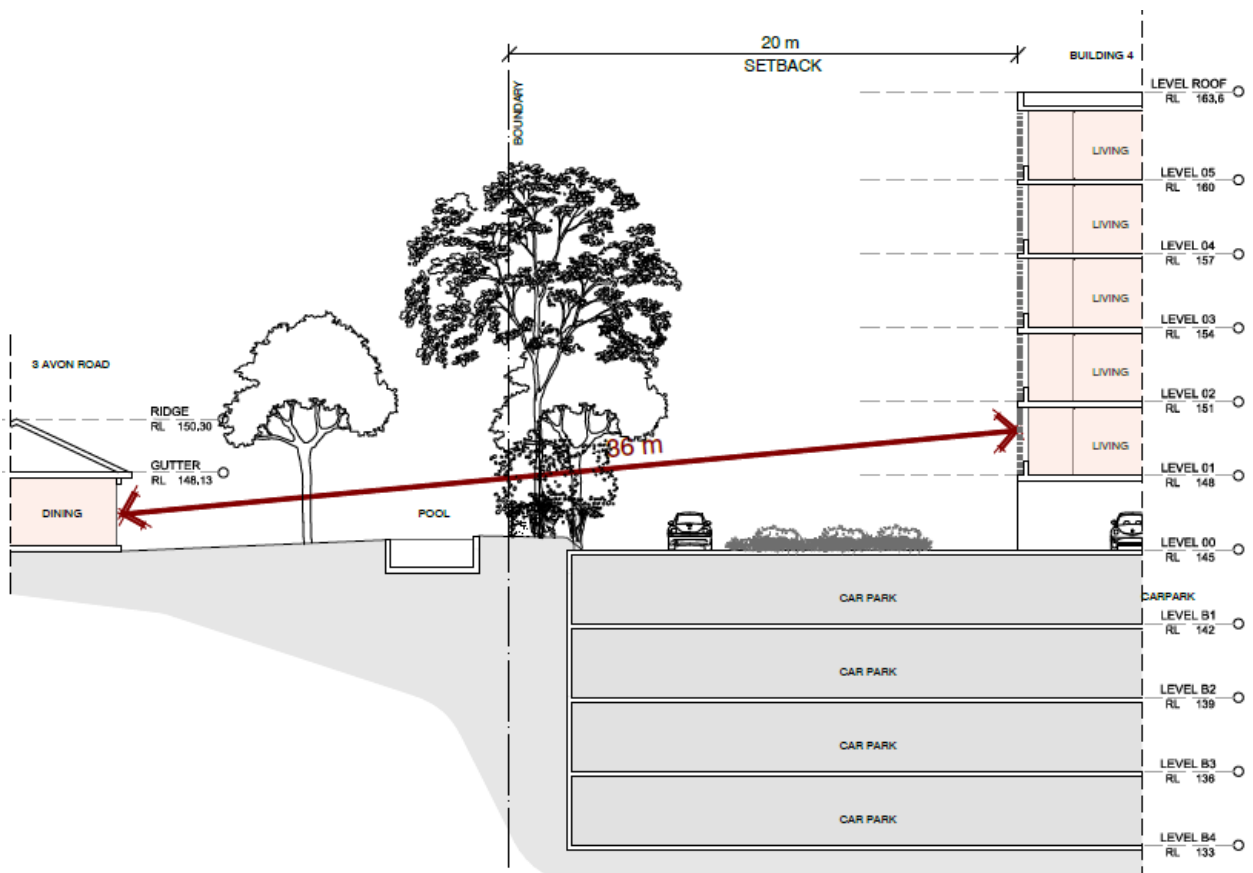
provides a section between Building 4 and 3 Avon Road.
